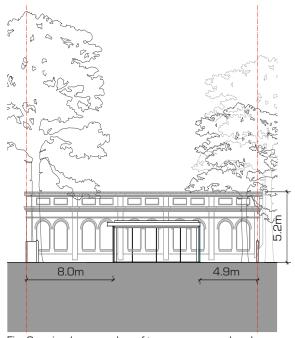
revised proposal- roof terrace removed and sedum roof added
